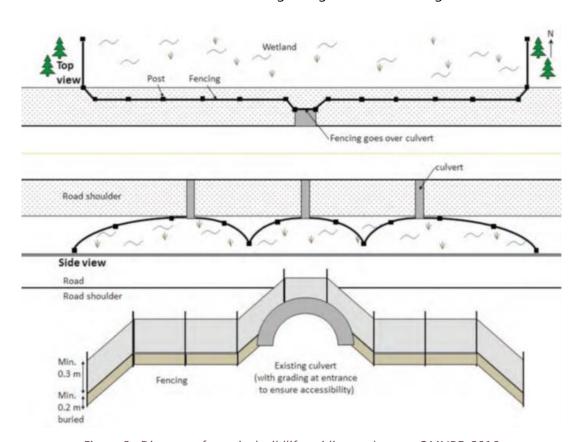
Diagram of a typical wildlife guiding underpass. OMNRF, 2016.
